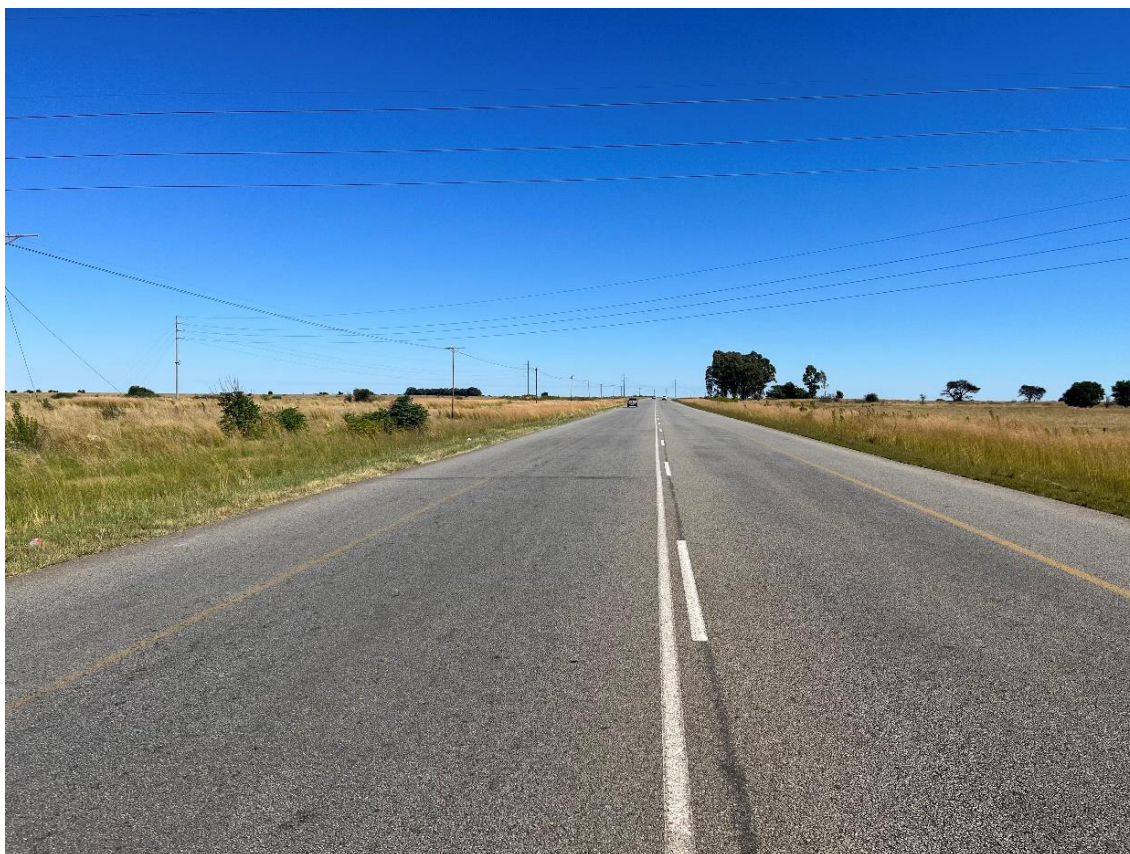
Existing Road P28-4 @ Km 7.15 – West Approaching (Access 1) (SiVEST, 2022)
